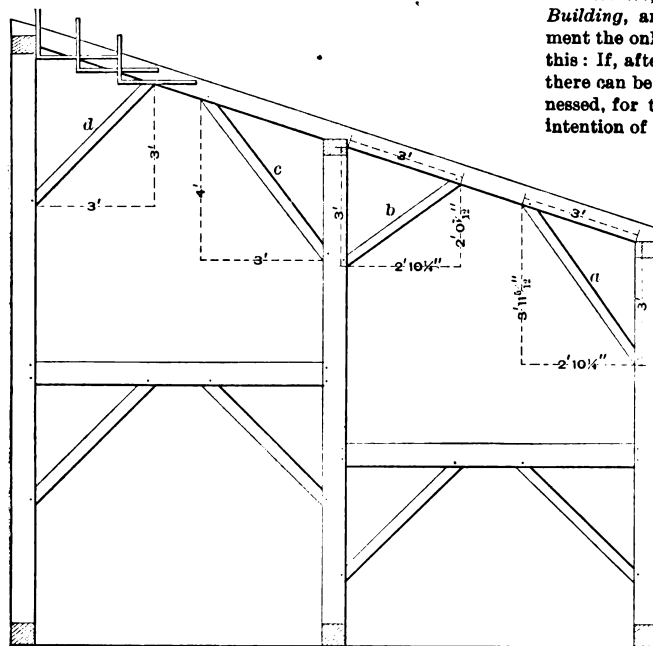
End Bent of Building with Roof Having a Rise of 4 Inches to the Foot.
